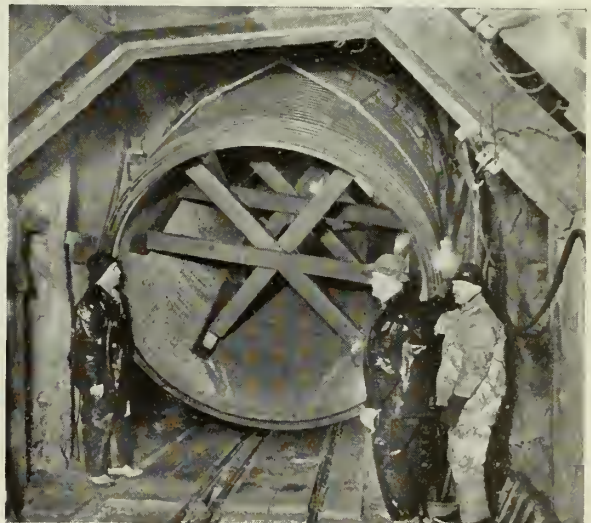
Lowering Tunnel Pipe at Bottom of Shaft.
